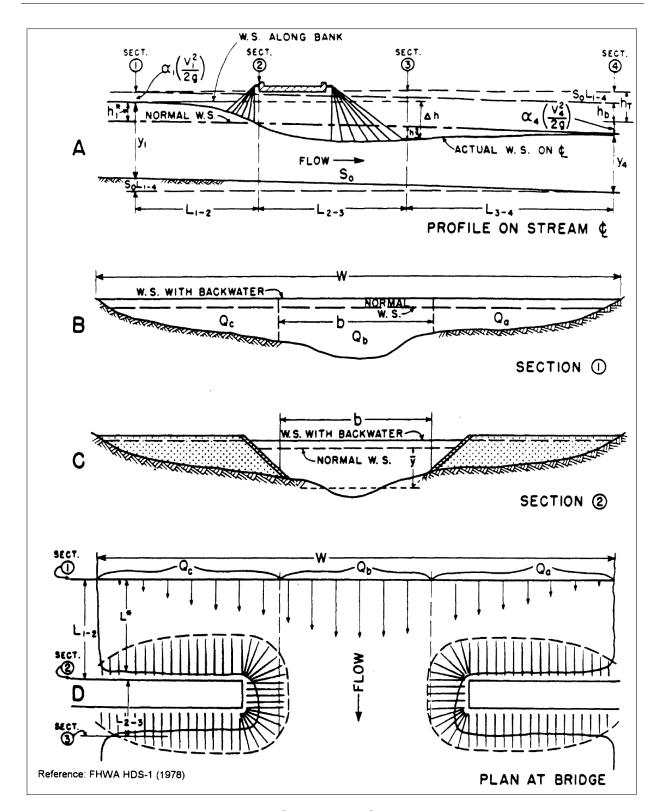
Normal Crossings: Spill-through Abutments
